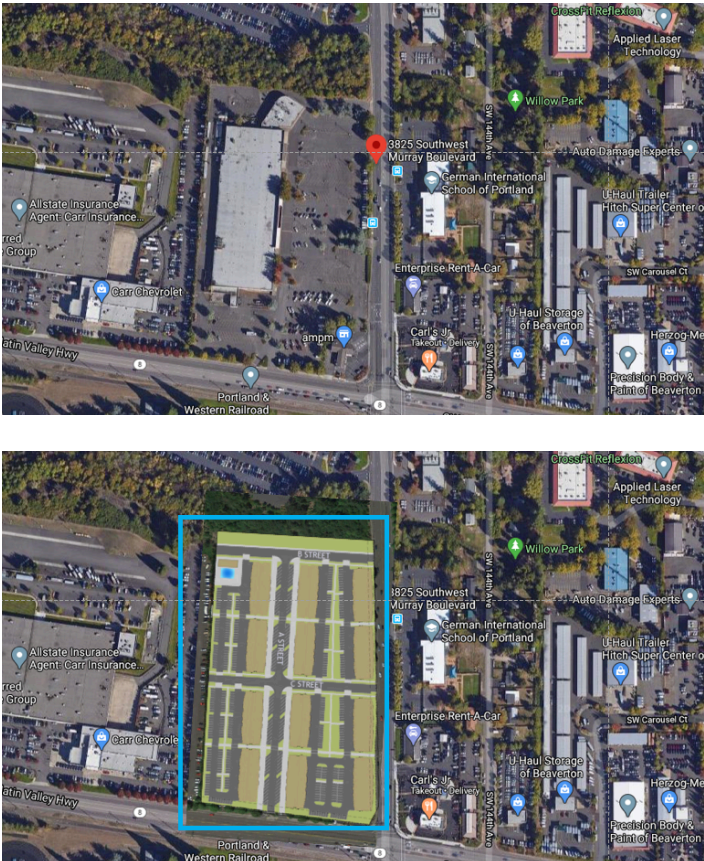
A West End District Site Location and Site Plan, as proposed. 2019.
